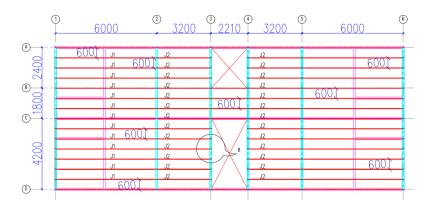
(b) – First floor framing plan used for G+5 building (Refer detail 'B' fig. 2 (c) for clarity
